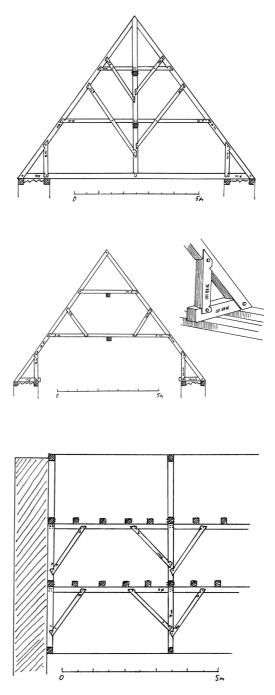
Sections of the late Gothic roofing in Askeryd with longitudinal beams and king posts. A rare phenomena in medieval Götaland? Every part in the construction is numbered, with separate systems for north and south. All joints are notched. Drawings by R. Gullbrandsson.
